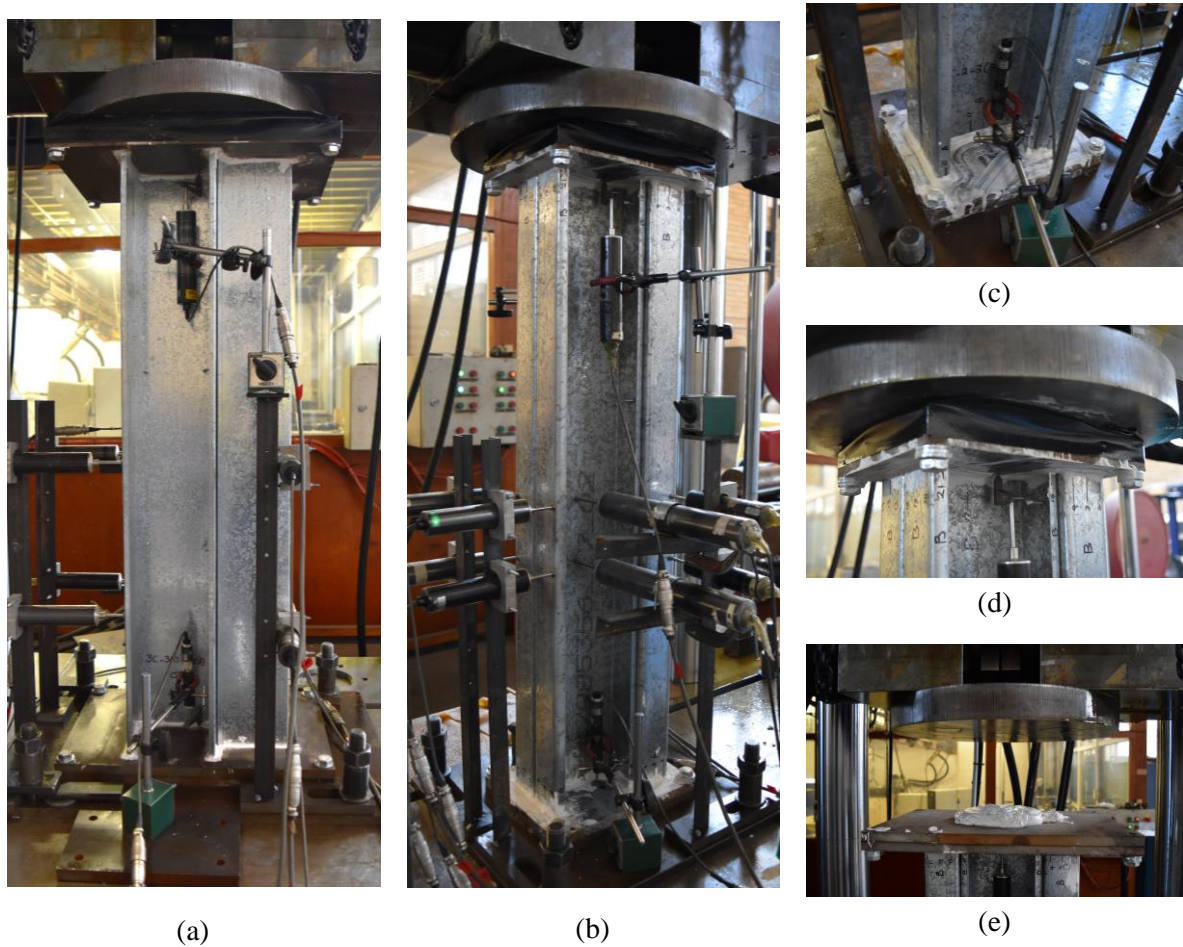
Details of the test set-up: (a) Series C120, (b) Series C64, (c) mounted transducers on the bottom end plate, (d) mounted transducers on the top end plate and (e) Patternstone layer between the loading plate and the top end plate before lowering cross-head
